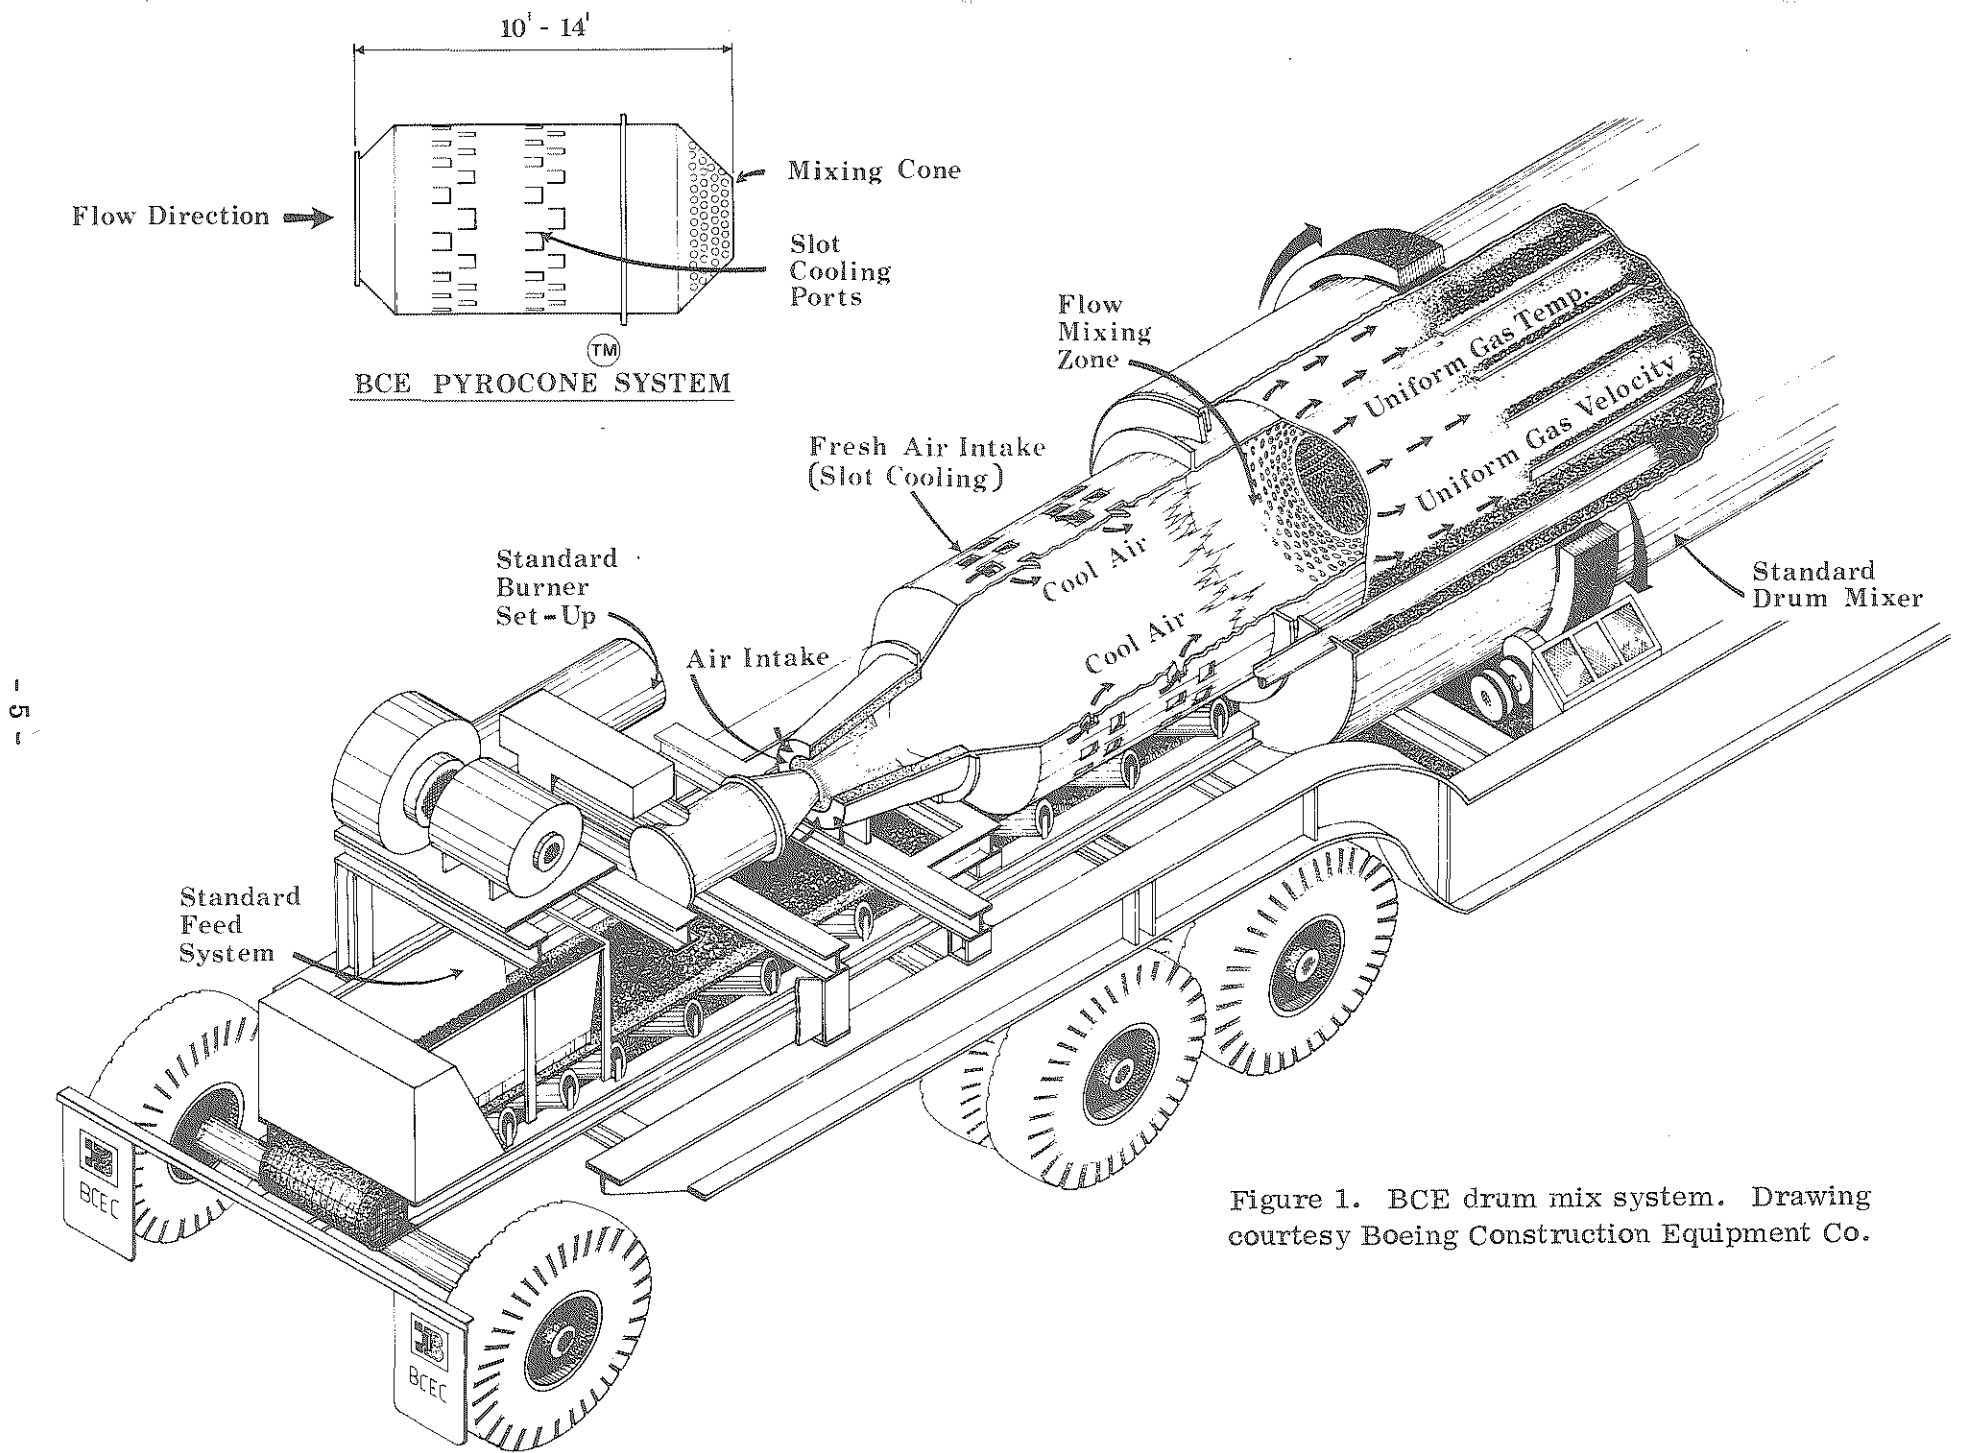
BCE drum mix system. Drawing courtesy Boeing Construction Equipment Co.
